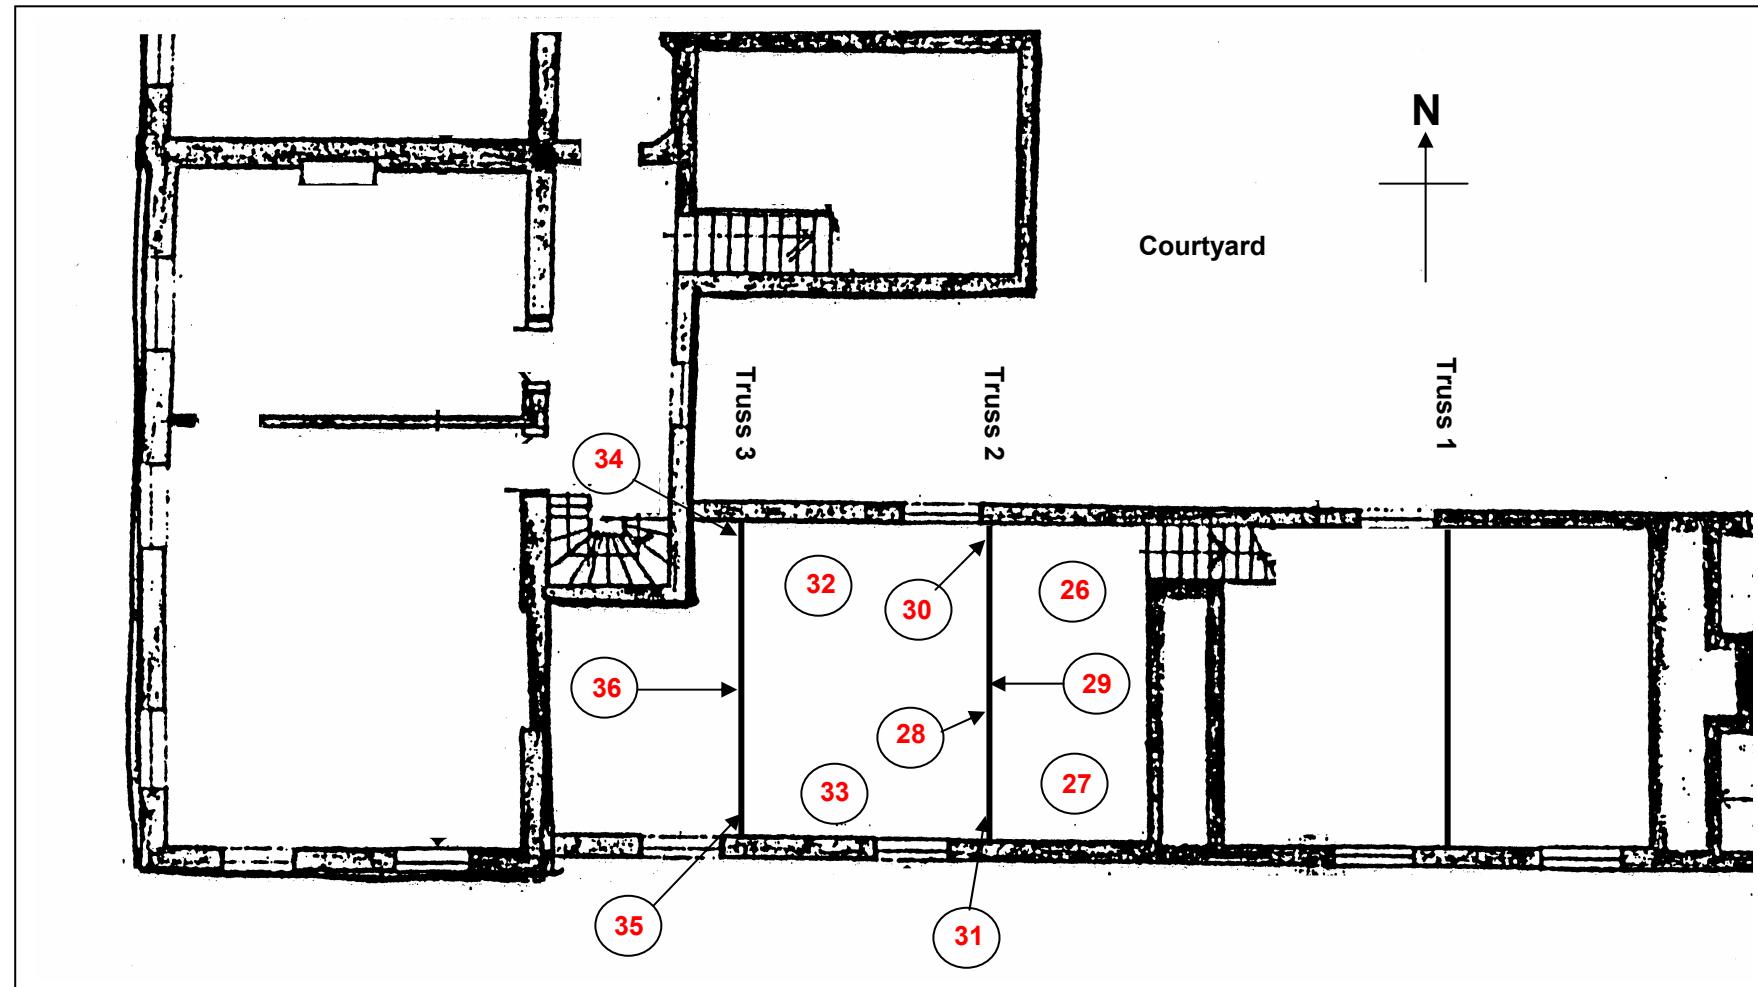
Schematic plan of Entry Hall roof to show sampled timbers
